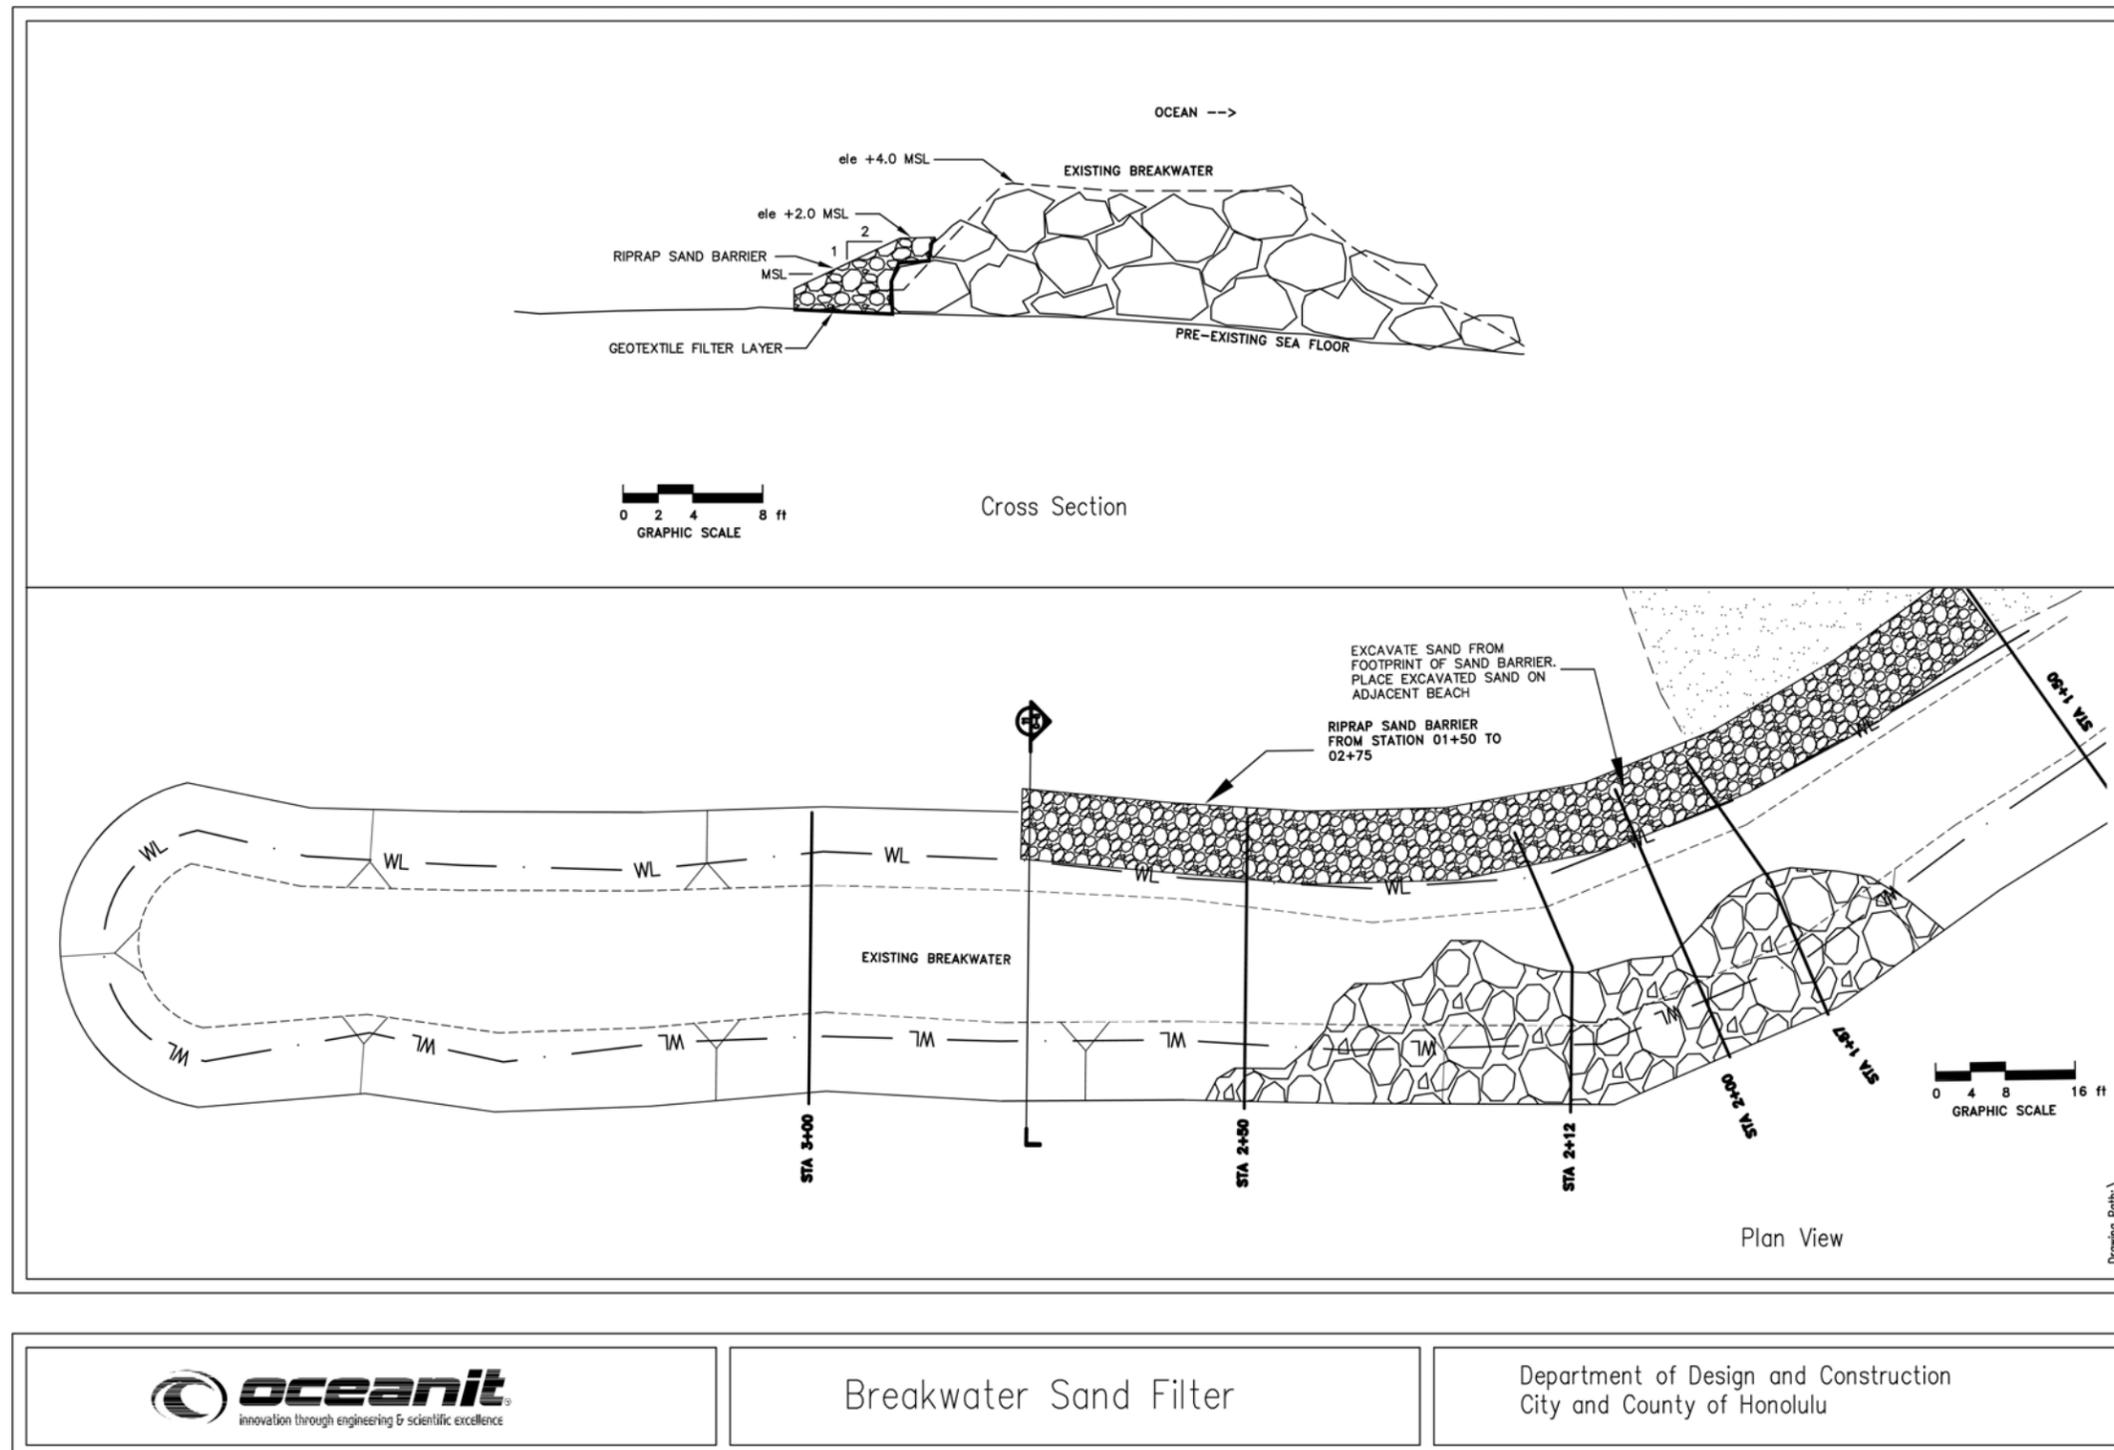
Proposed Sand Filter on Existing Breakwater
